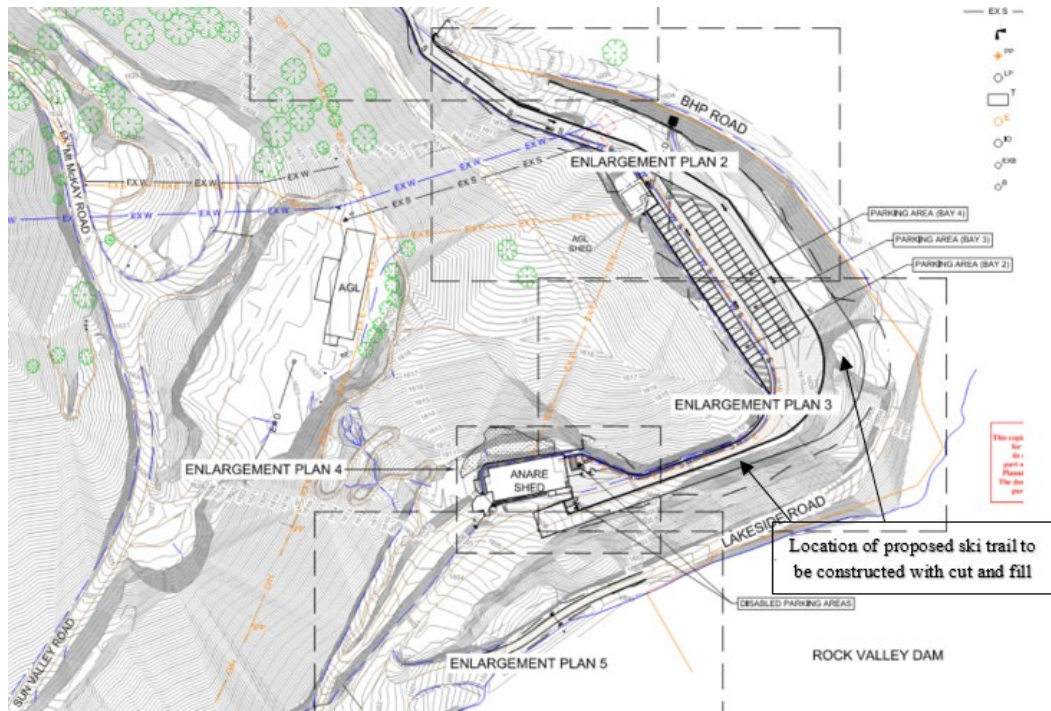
Proposed overall site plan, extracted from the advertised civil drawings, showing the location of the ANARE shed and the proposed expanded car park relative to BHP Road and Rocky Valley Dam. The Tribunal’s annotation shows the location of proposed works to create a new ski trail.
